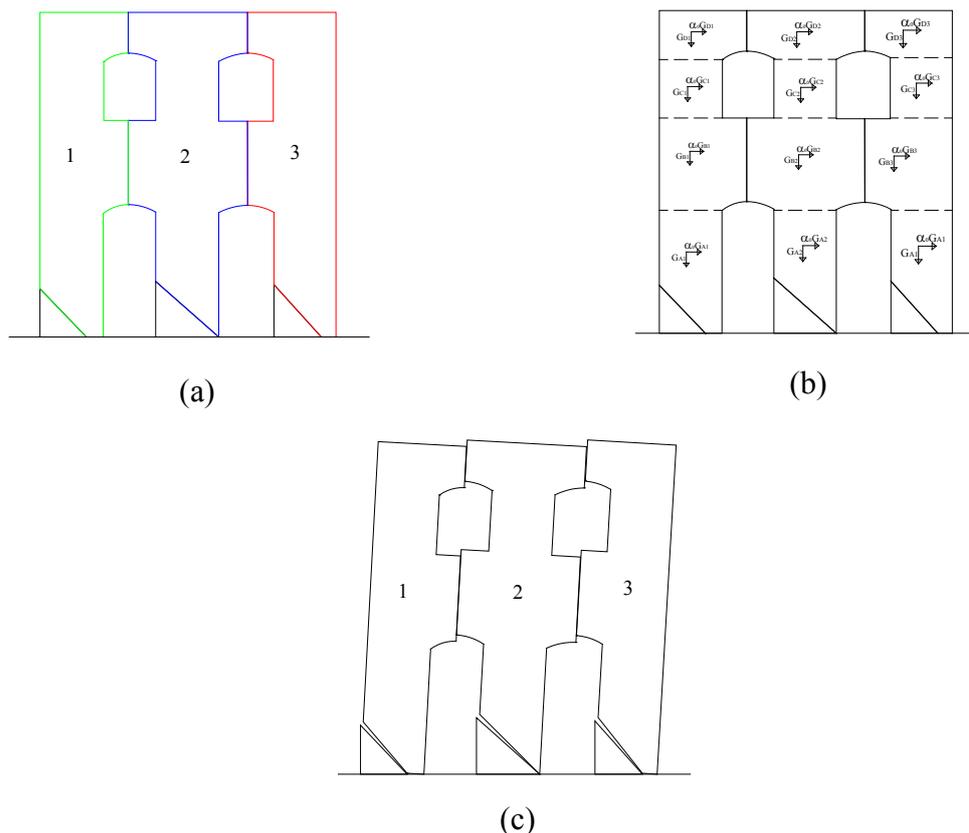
Macro block modelling for masonry wall 1, (a) macro blocks, (b) lateral forces at macro blocks, (c) failure mechanism
